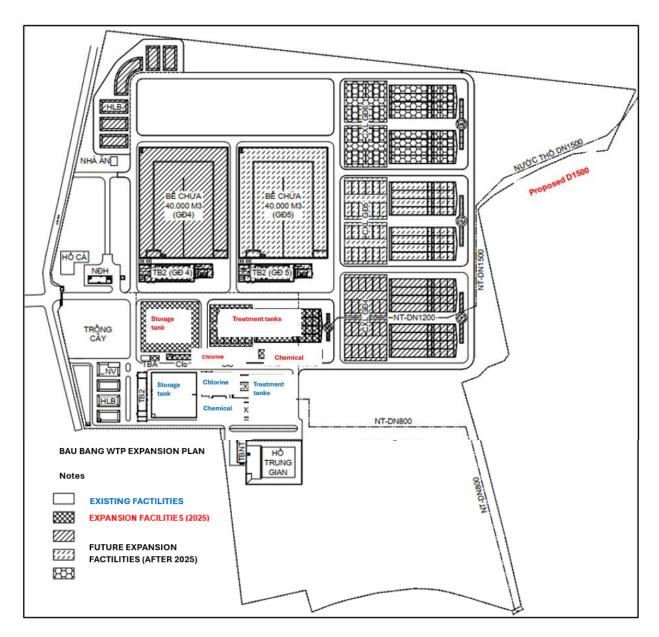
Bau Bang WTP expansion facilities layout (FS, 2023)
